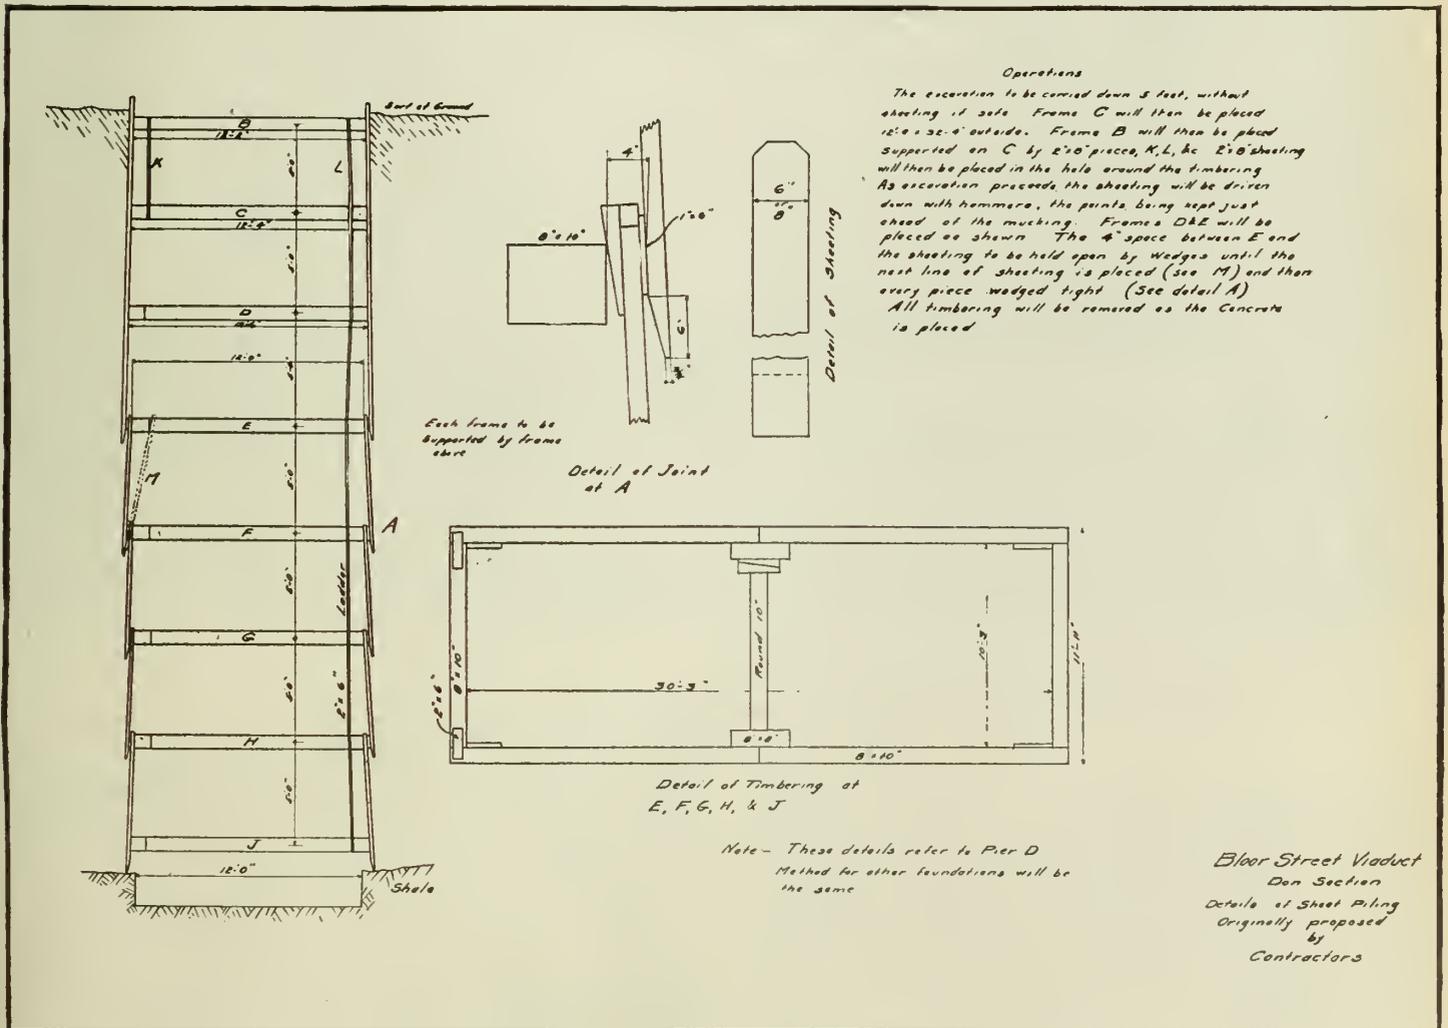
Sheetting Proposed by Contractors, for Piers B, C, D and E, Don Bridge.
